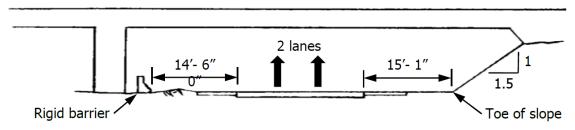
Bridge elevation view of horizontal clearances for a 2-lane, 1-way highway feature below the bridge, with a rigid barrier.
